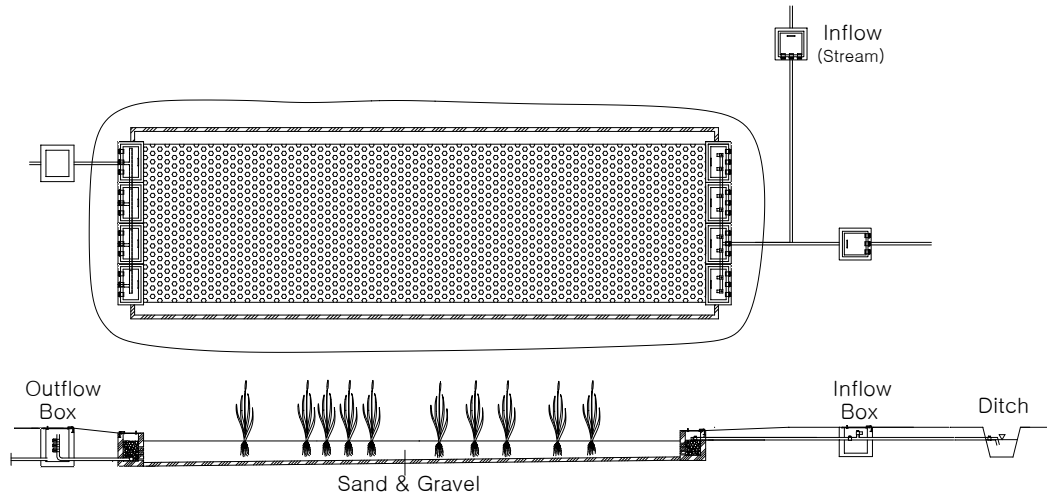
Schematic plan and section of the subsurface wetland system constructed on a flood plain
